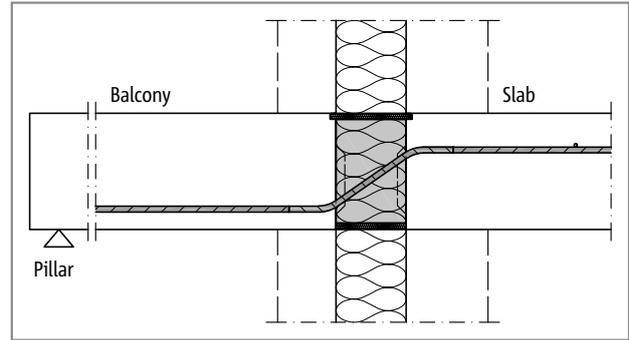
Schöck Isokorb® XT type Q: Connection with non-load-bearing double wall masonry (XT type Q-V5 to V8)
